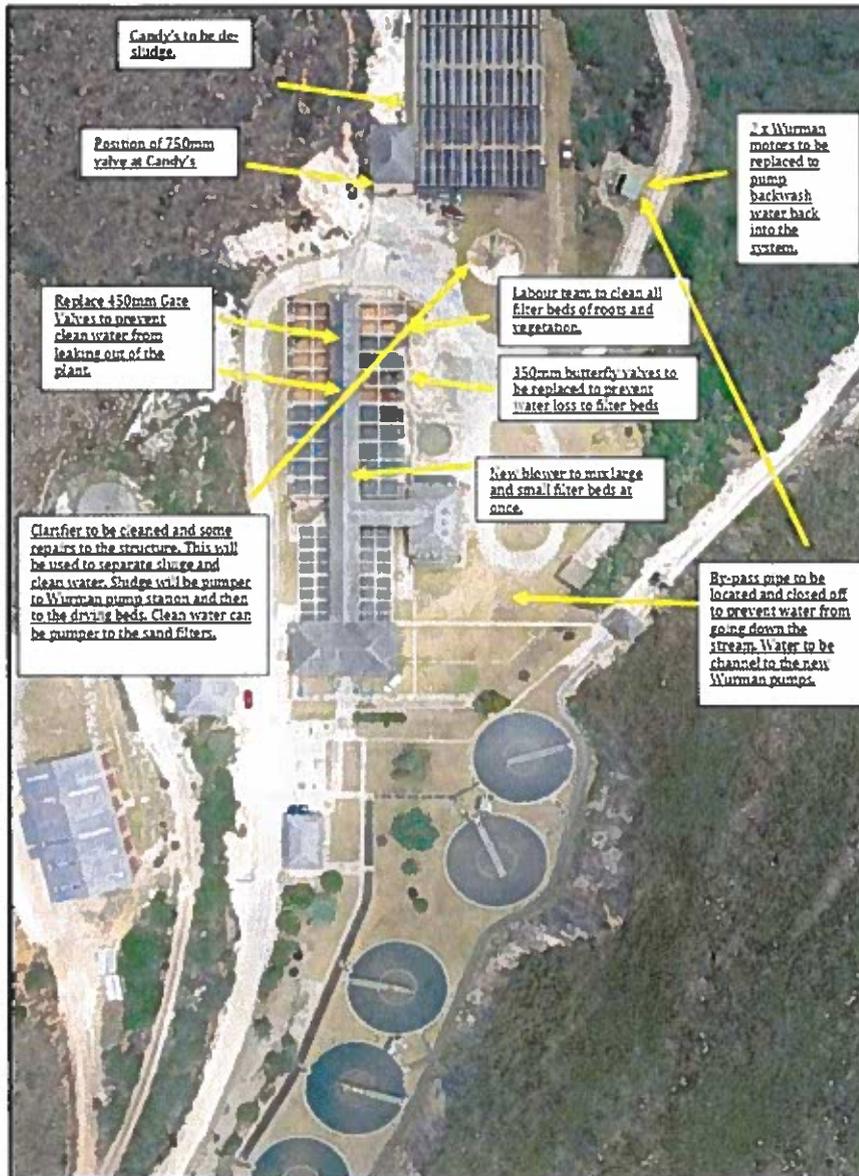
Plan view of the Churchill WTW with relevant scope of works for emergency repairs
